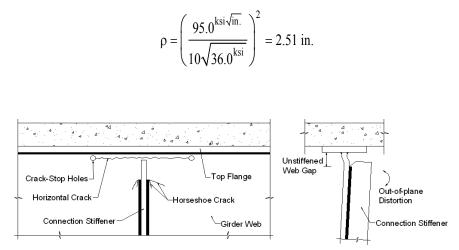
Fatigue Crack with Drilled-Crack-Stop Holes
